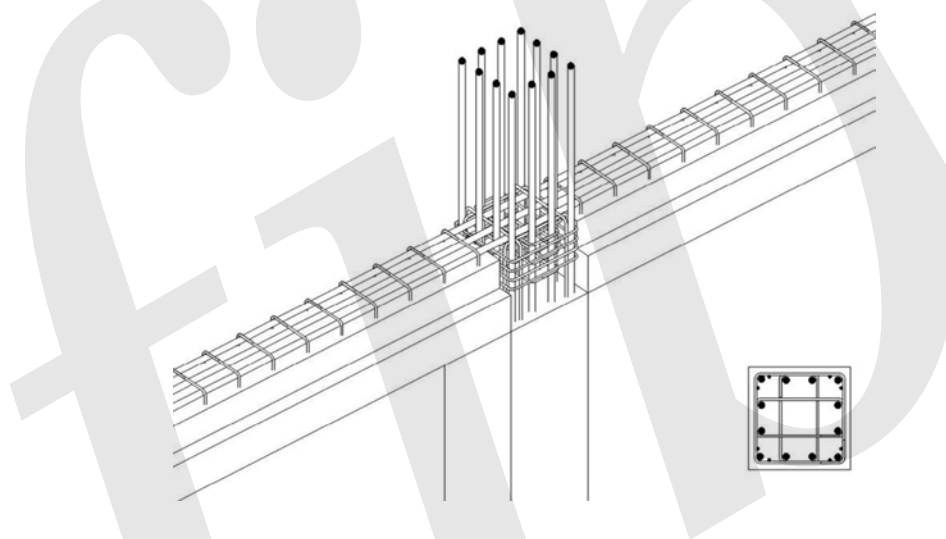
Simple inverted T beam and storey height column. Column links continue through insitu stitch as shown in the 3D view and plan section (example of emulative system, modified after *fib* Bulletin 78¹⁵).
